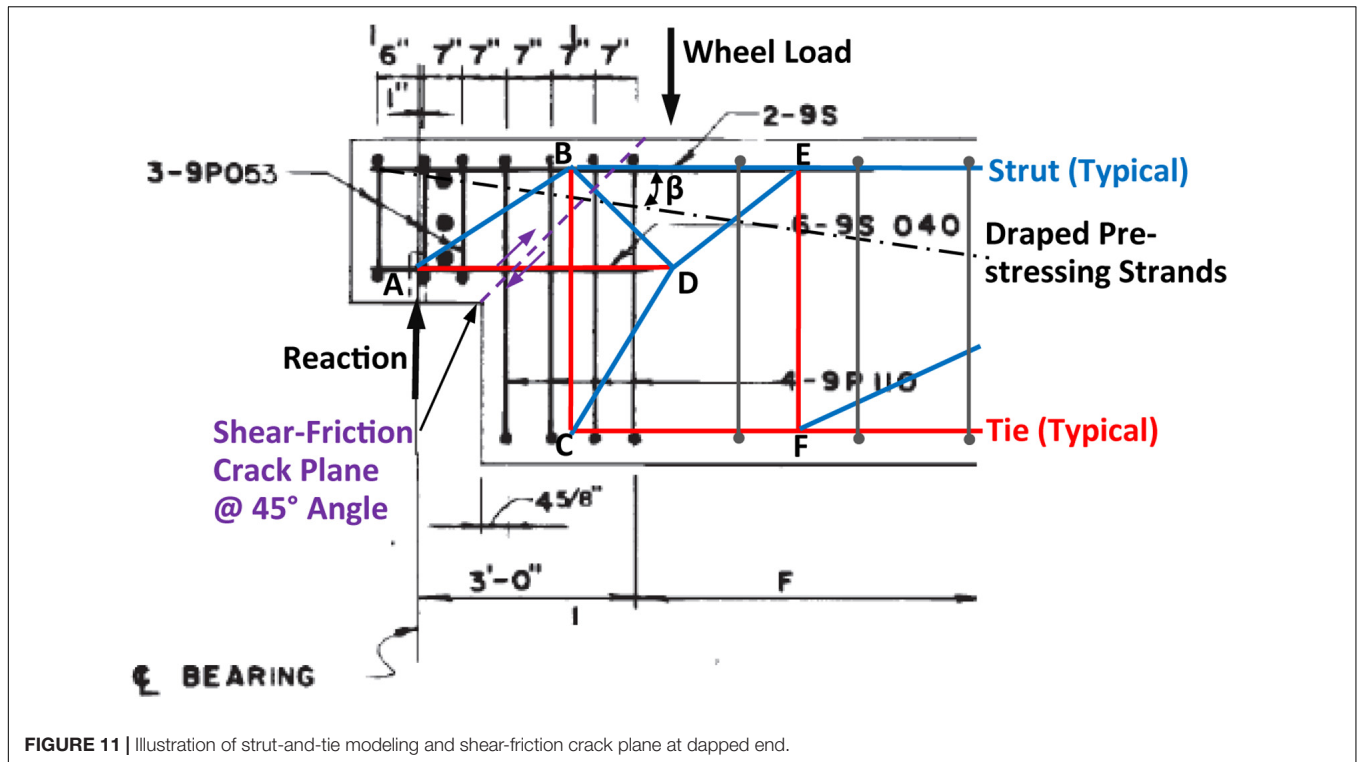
| Illustration of strut-and-tie modeling and shear-friction crack plane at dapped end.
